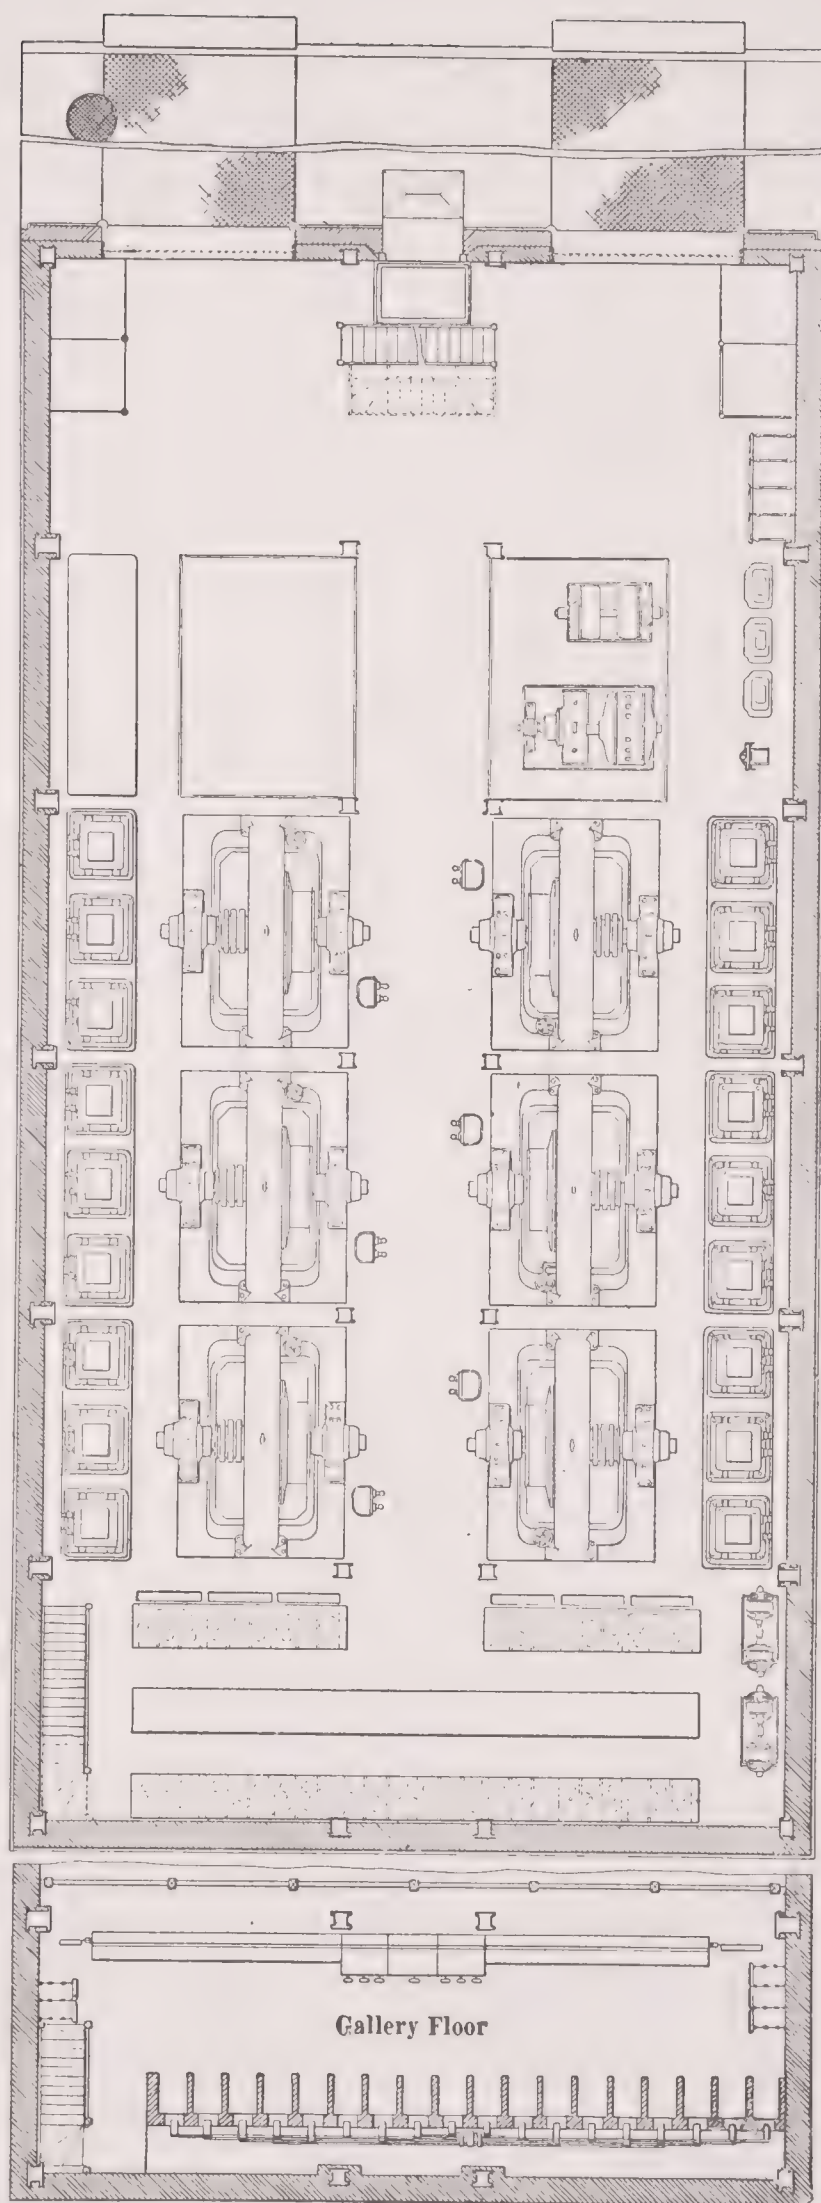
NEW YORK SUBWAY: CONVERTER FLOOR-PLAN OF SUB-STATION No. 14.
